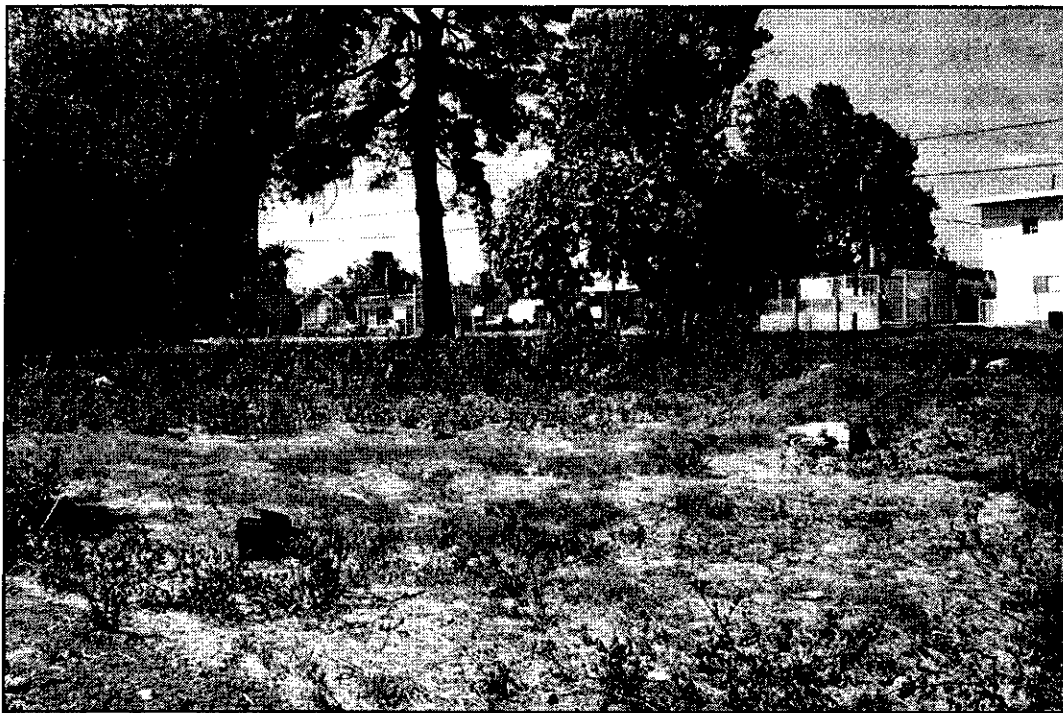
View of project site looking southeast from corner of South Normandie and West 104th Street.
